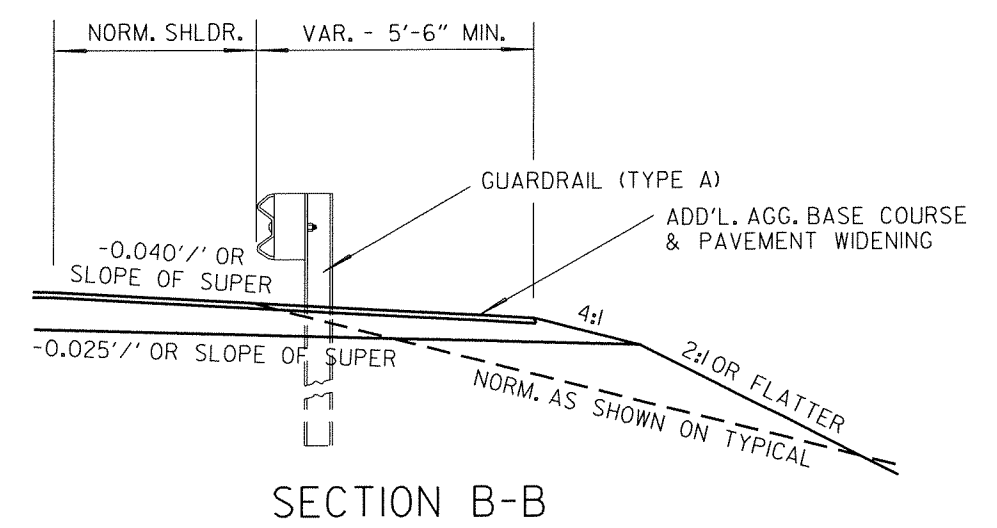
DETAILS OF WIDENING FOR GUARDRAIL (28'-0" CLEAR ROADWAY CAST IN PLACE BRIDGE)
